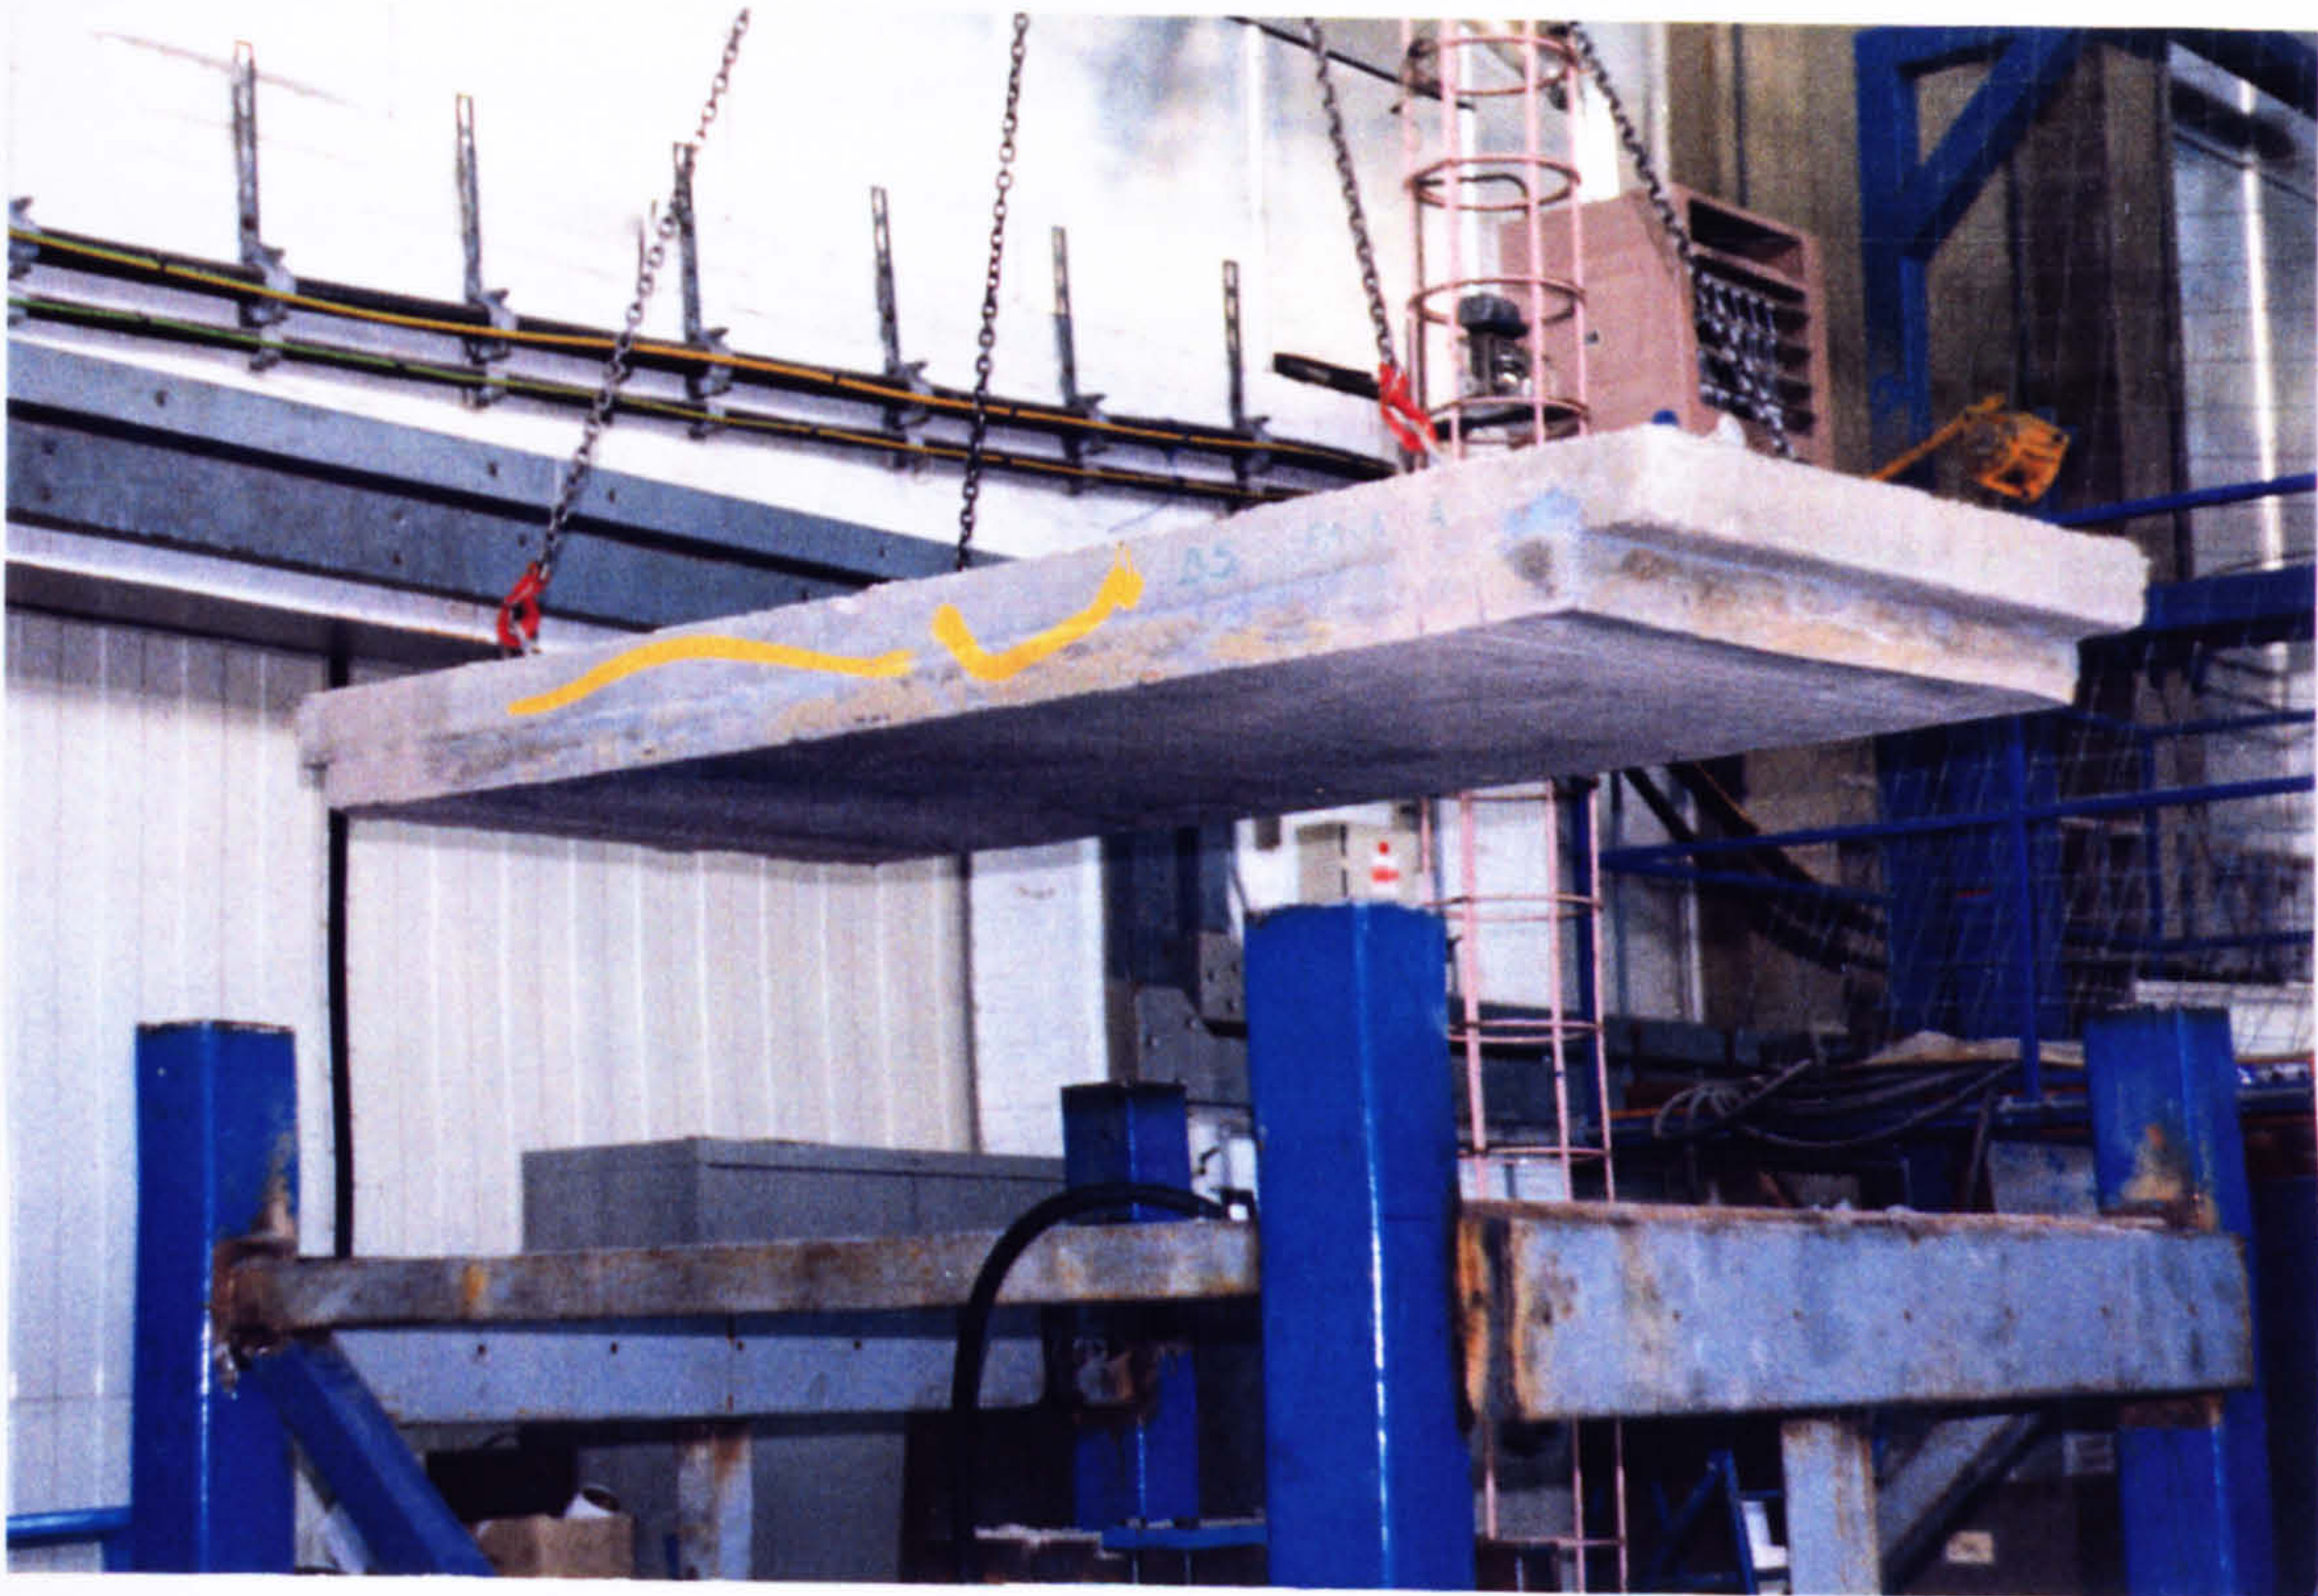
A typical test slab being lifted off the scaffolding onto the loading frame for static/fatigue load testing.
